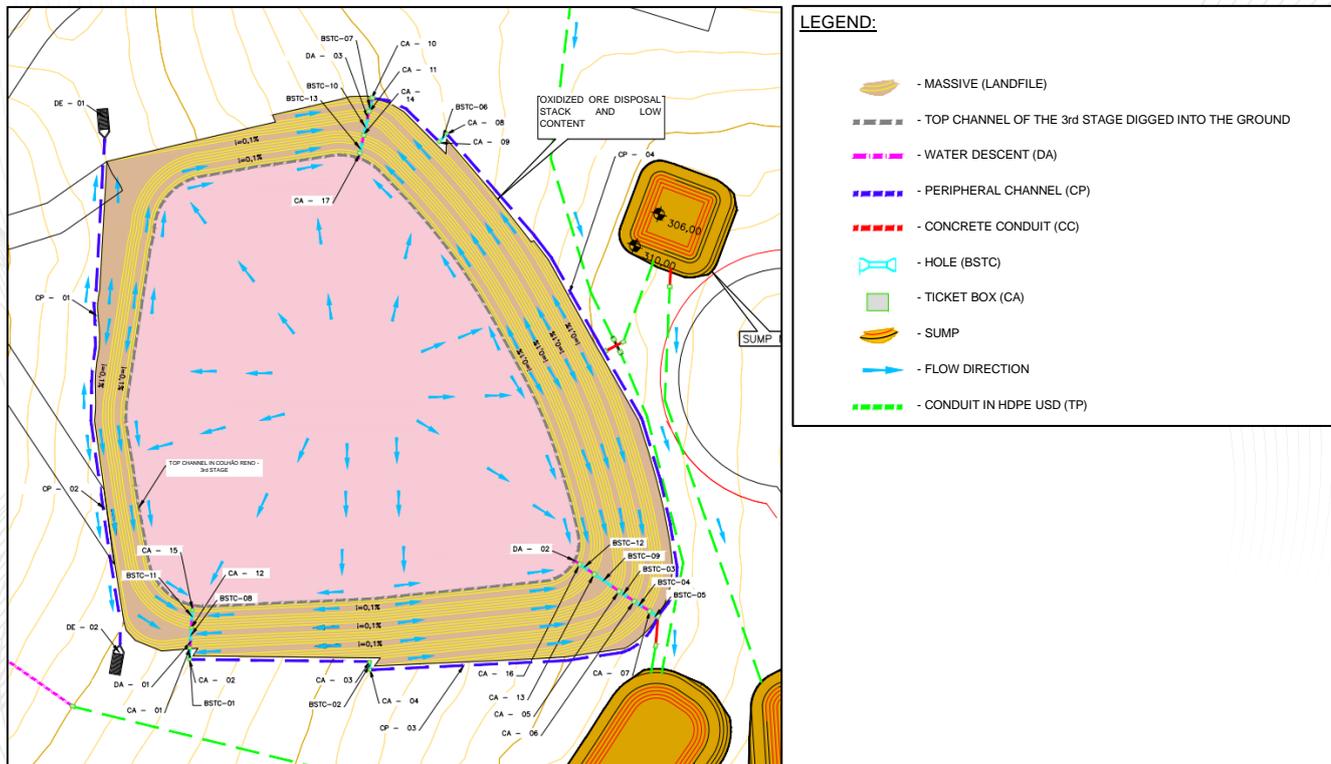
Plant surface drainage Low Grade Ore stockpile - PMBT (GHT, 2022)
